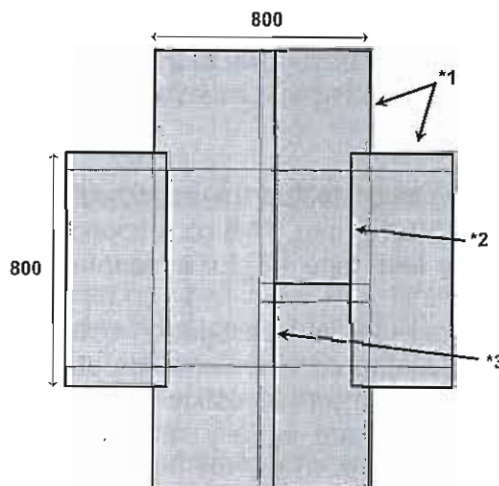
Layout of the seams (\*1 = wall-corner seam, \*2 = base-corner seam, \*3 = T-seam) in the sheeting to be tested (dimensions in mm)
